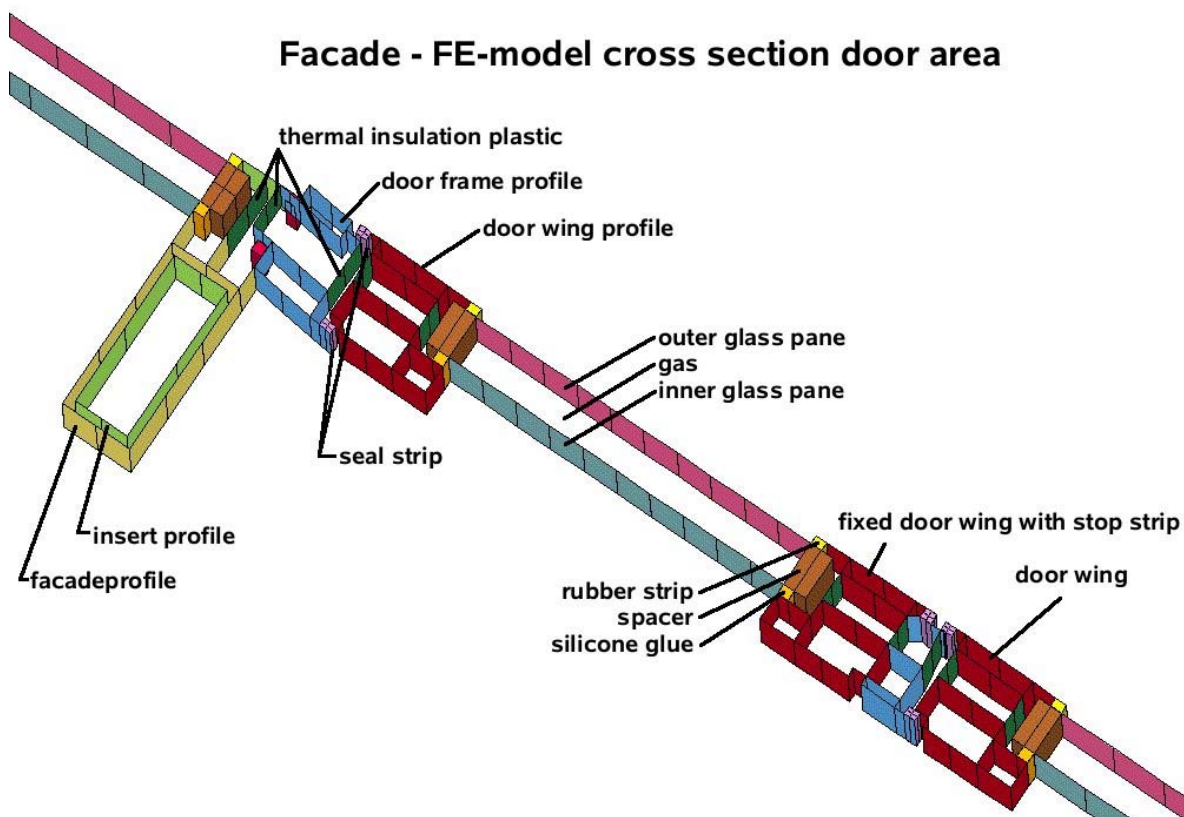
Facade - cross section with frame and insulated glass pane (FE-model)
